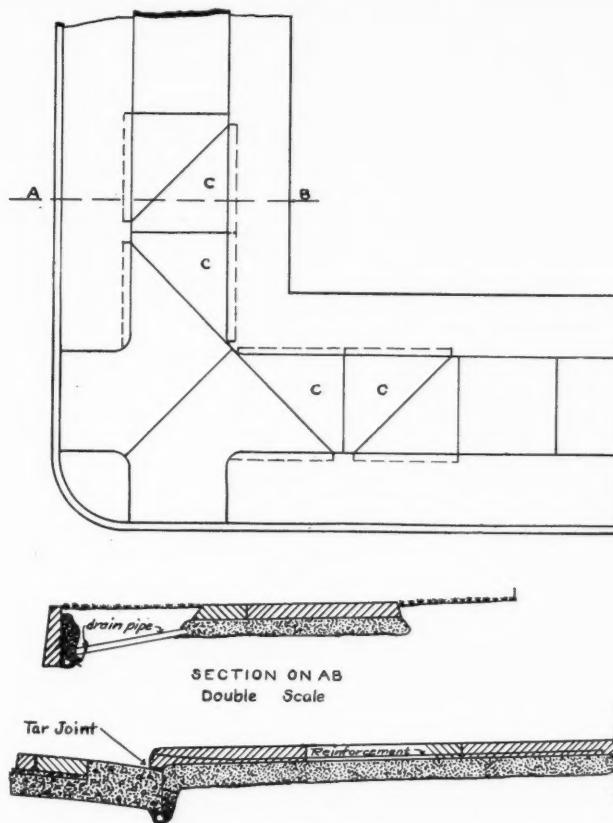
PROPOSED CONSTRUCTION OF CONCRETE SIDEWALK.
